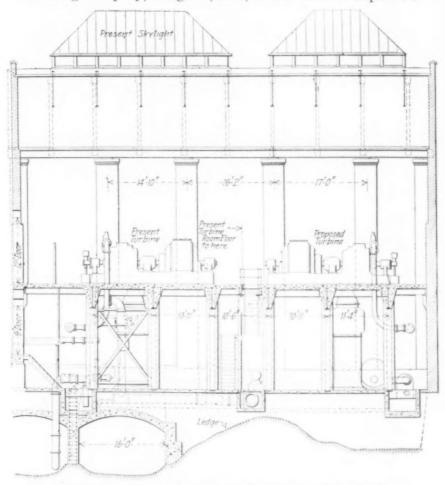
Sectional Side Elevation of Turbine Room for Boott Mills, showing Support of Turbine by Girders
